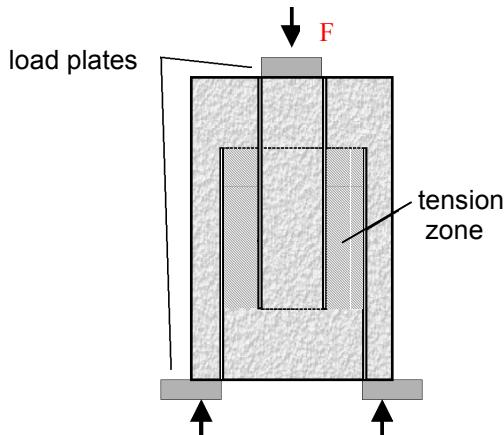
General testing layout and sample geometry for the Modified Tension Test.
